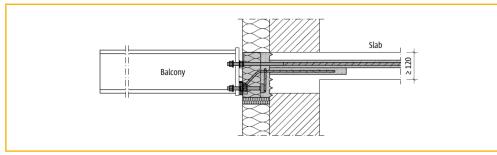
Connection with thermal insulation composite (TCIS) system and thin floor with type RKS
